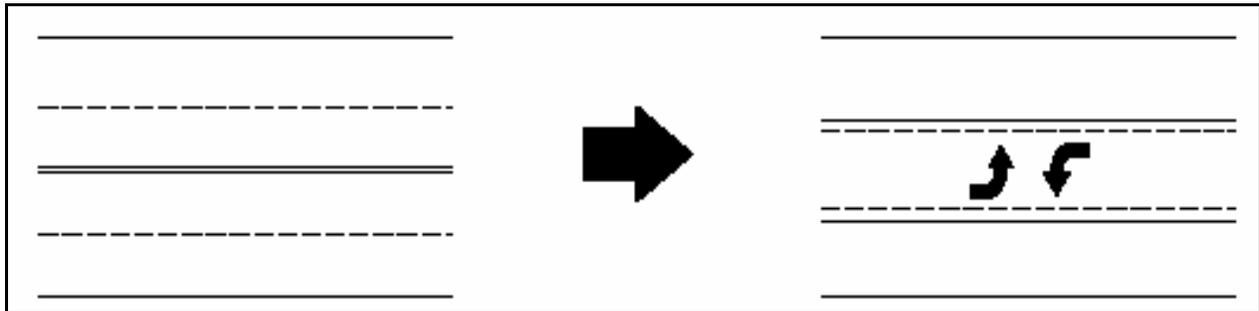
Four-lane Undivided Roadway to Three-lane Roadway with TWLTL (20)
